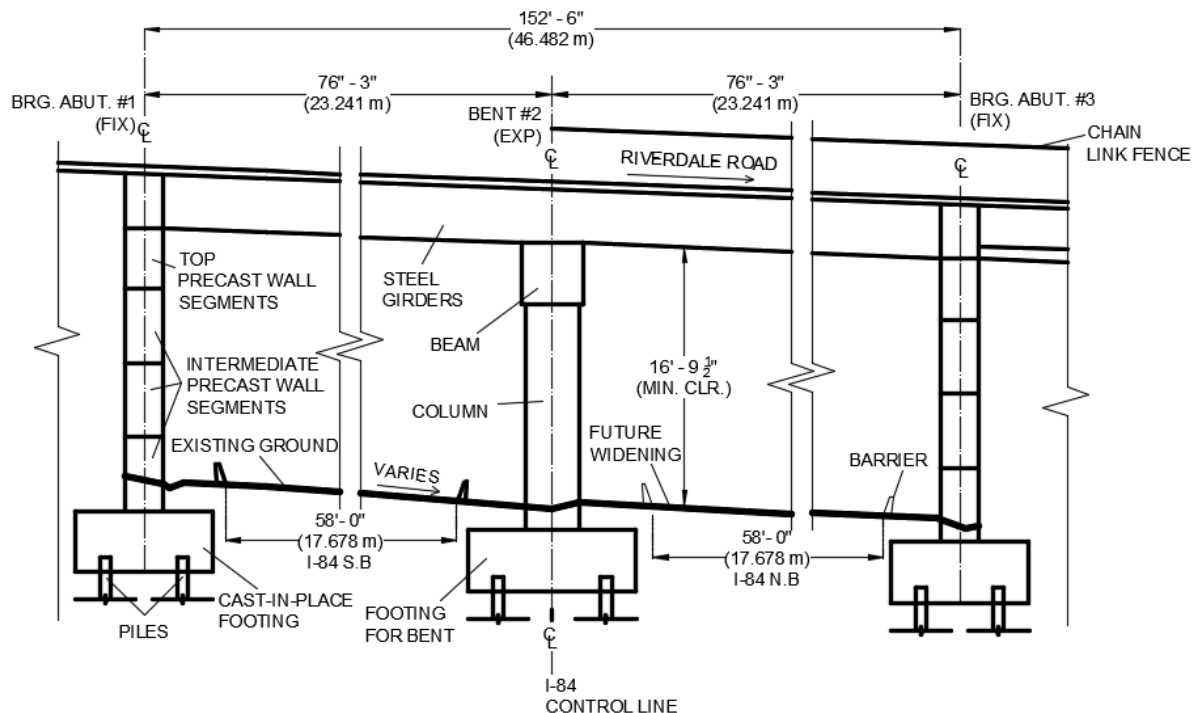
Riverdale bridge elevation (Elevation normal to highway I-84)
